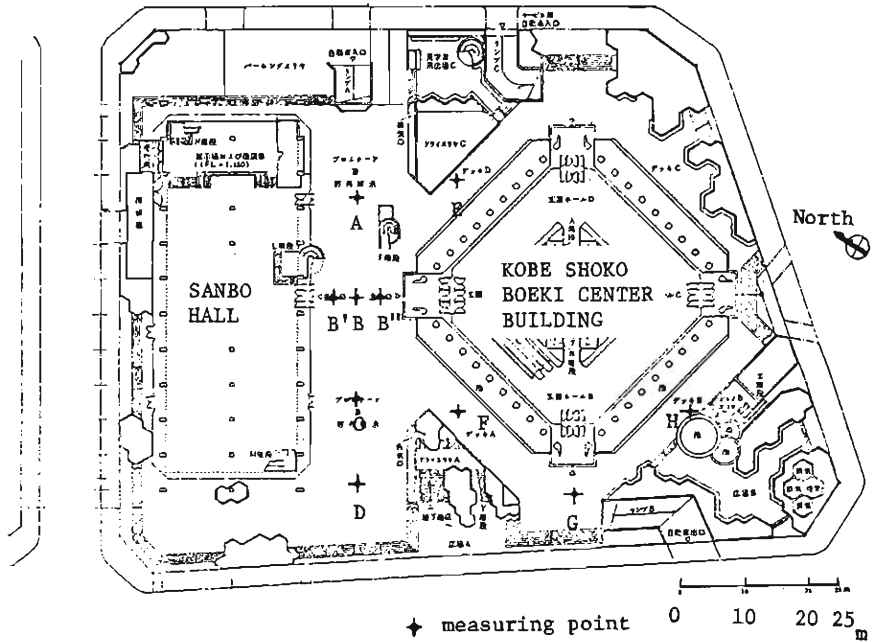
Site plan around the Kobe Shoko Boeki Center Building.
